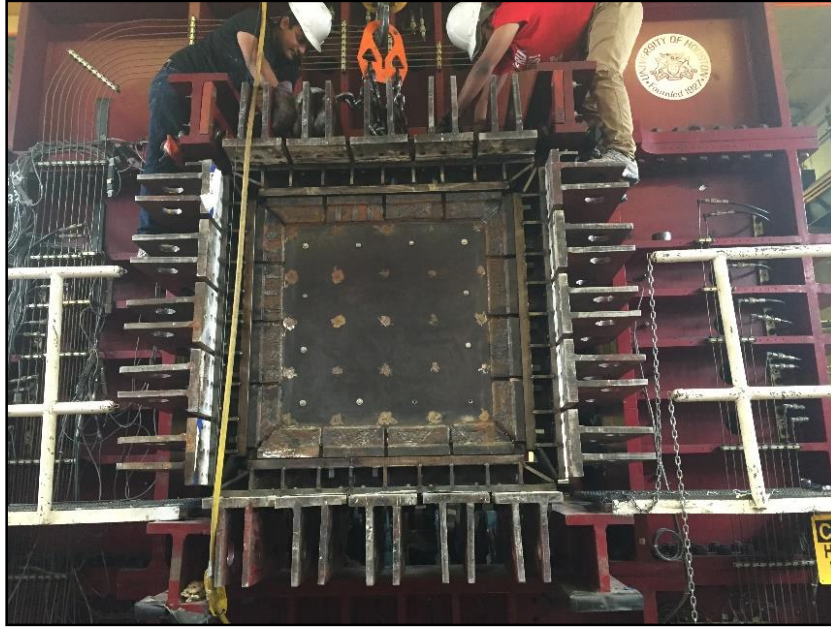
Placement of specimen S-UHPC-10 inside The Universal Panel Tester
